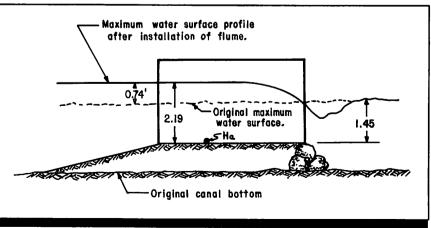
Analysis of upstream and downstream water elevations and crest elevation above the channel bottom.
